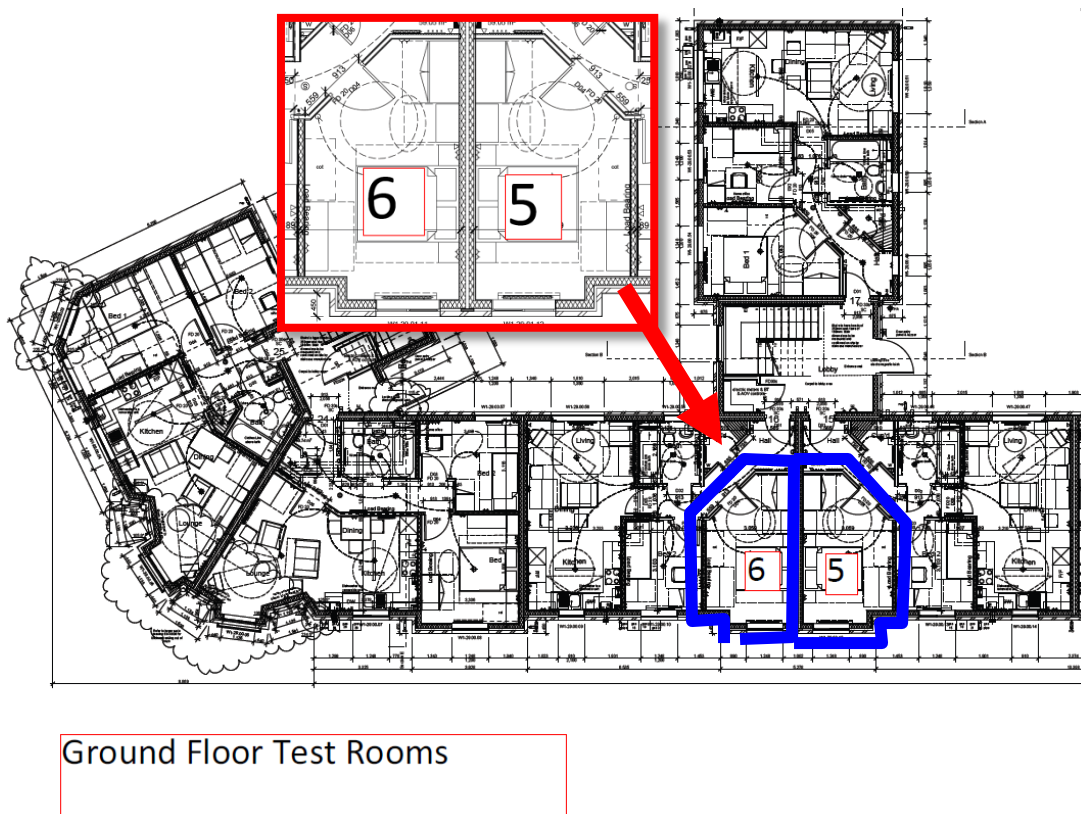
Site layout showing typical test rooms on ground floor of flats(blue) on Midlands test site with matched pairs of rooms on 1<sup>st</sup> floor above (red).
